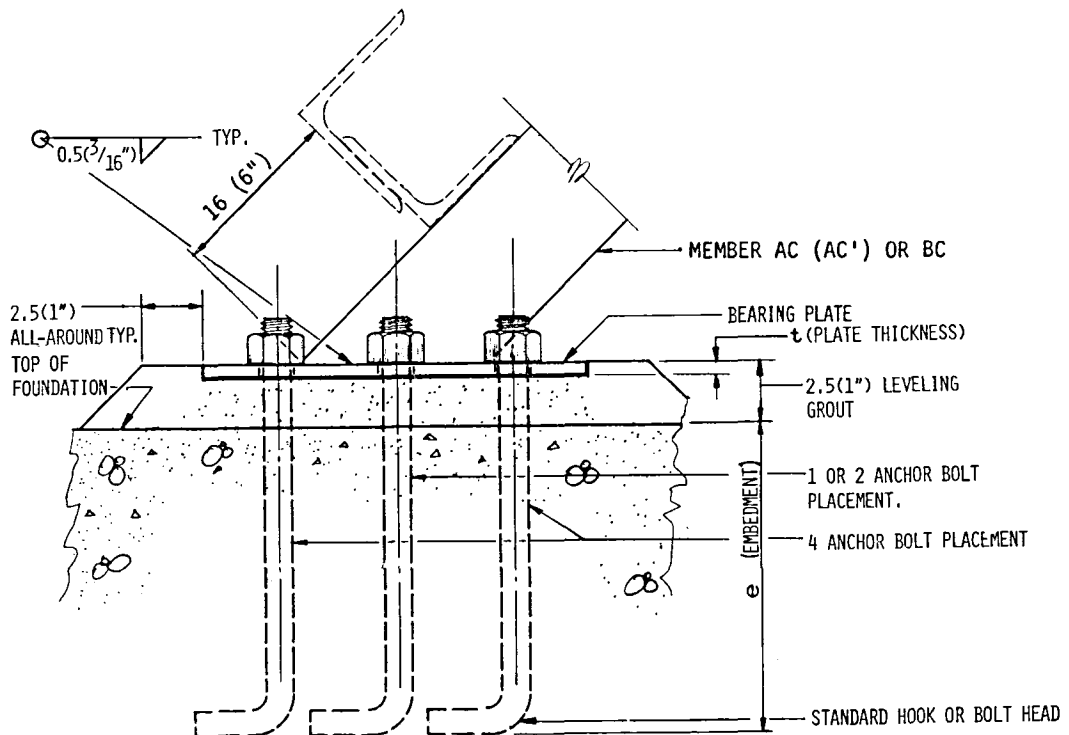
Foundation Connection Detail, Side View for Members AC and BC
